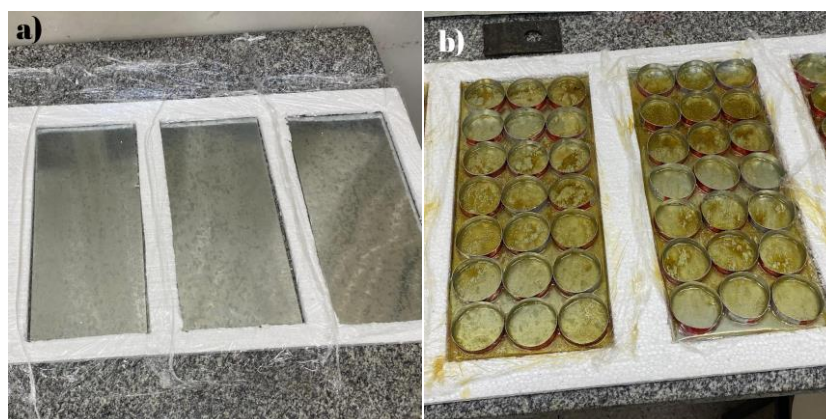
Panel manufacturing: (a) galvanised steel faces in the moulds, (b) aluminium rings and castor-oil adhesive spread out.
